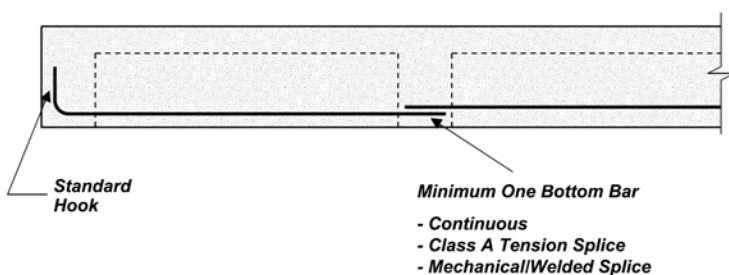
In joist construction, at least one bottom bar must be continuous or must be spliced with a Class A tension splice or mechanical or welded splice. At a non-continuous end of the joist, the bars must be terminated with a standard hook. Structural integrity requirements for joist construction are provided in Section 7.13.2.1.
